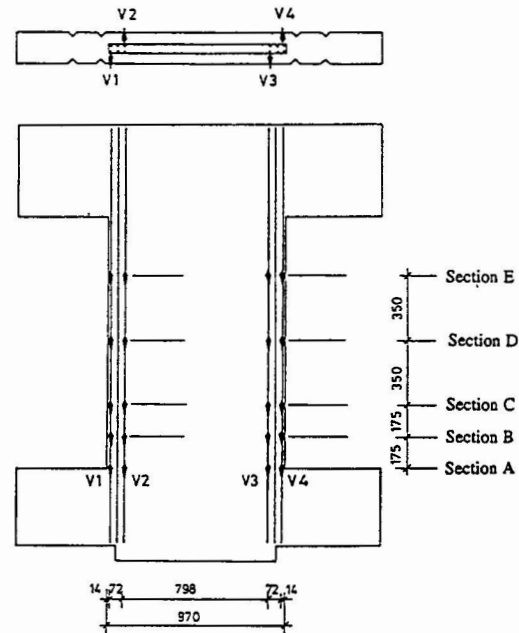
Typical instrumentation of concentrated vertical steel with strain-gauges
